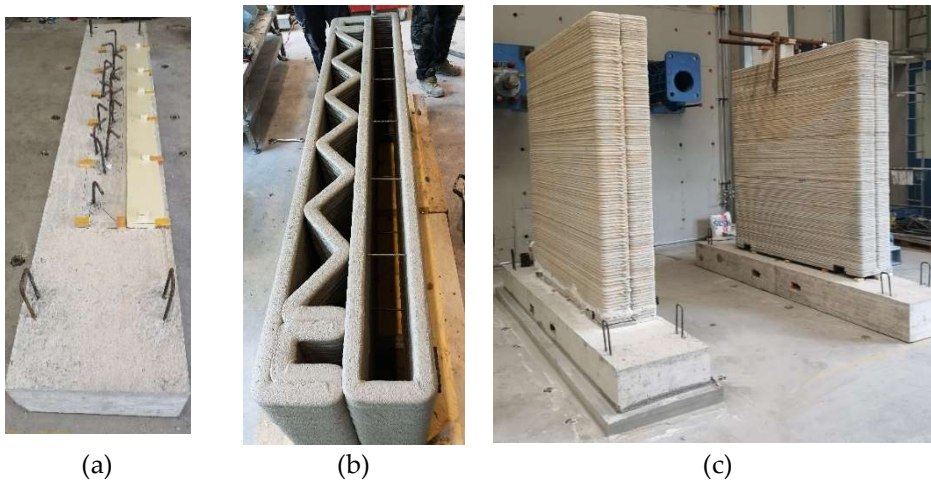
3DPC wall: (a) reinforced concrete foundation, (b) cross-section of the wall, (c) printed walls.
